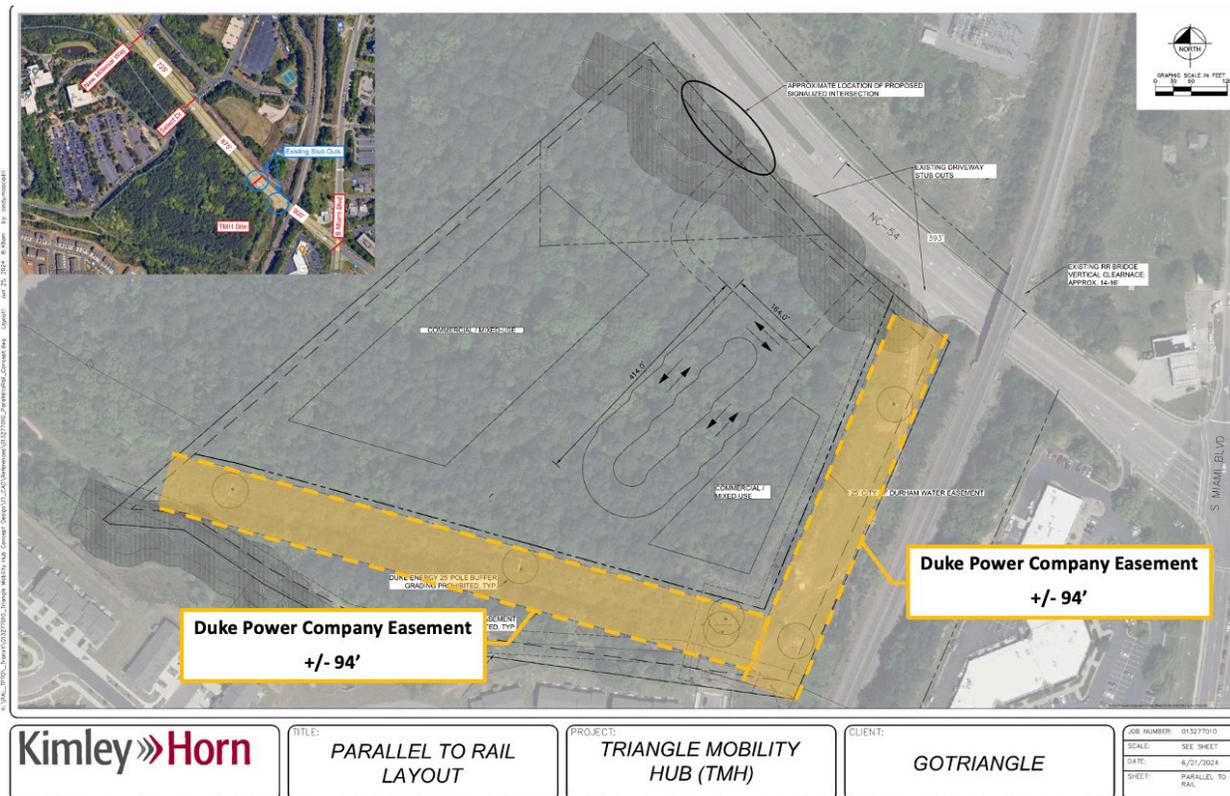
Conceptual site layout showing the bus facility located parallel to the railroad.
